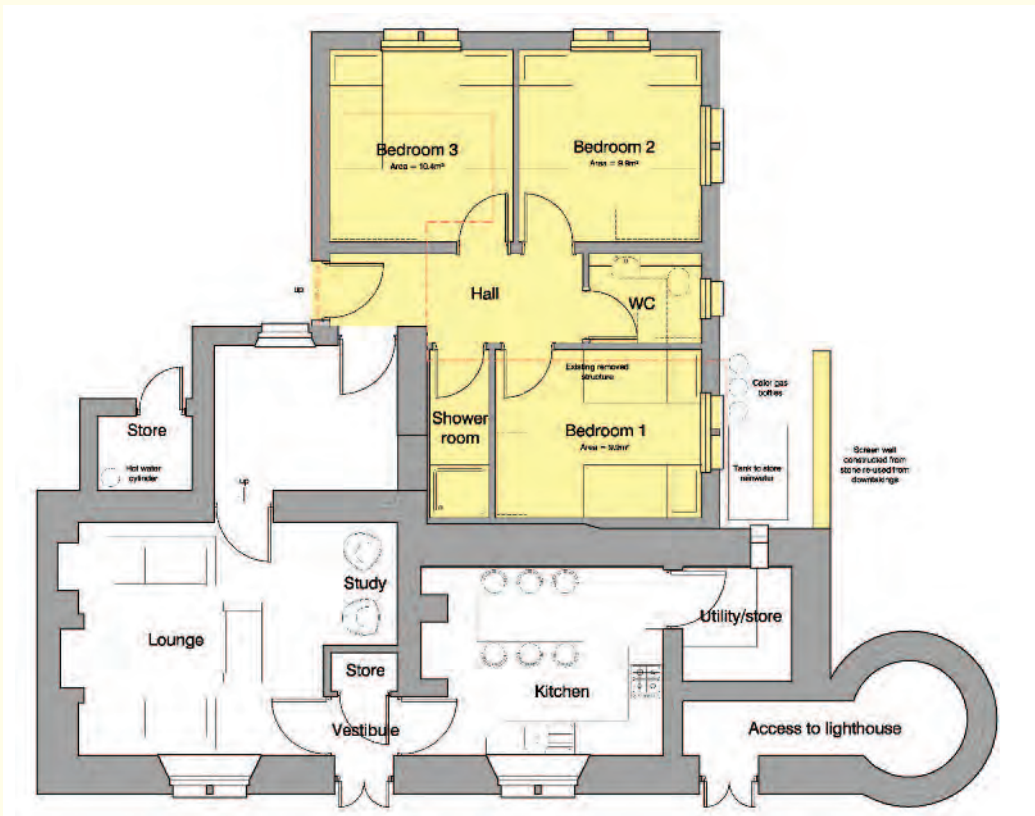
Ground plan of proposed upgrade. © IoMBO Trust
